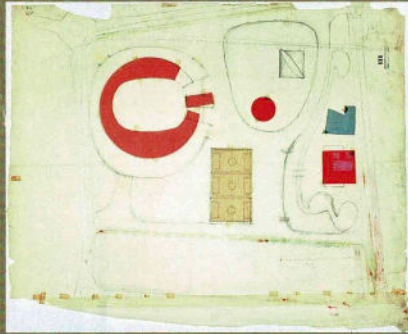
The drawing of urban outline, site plan, 1958, when 'Madrass' was. © FLC-DALCO
